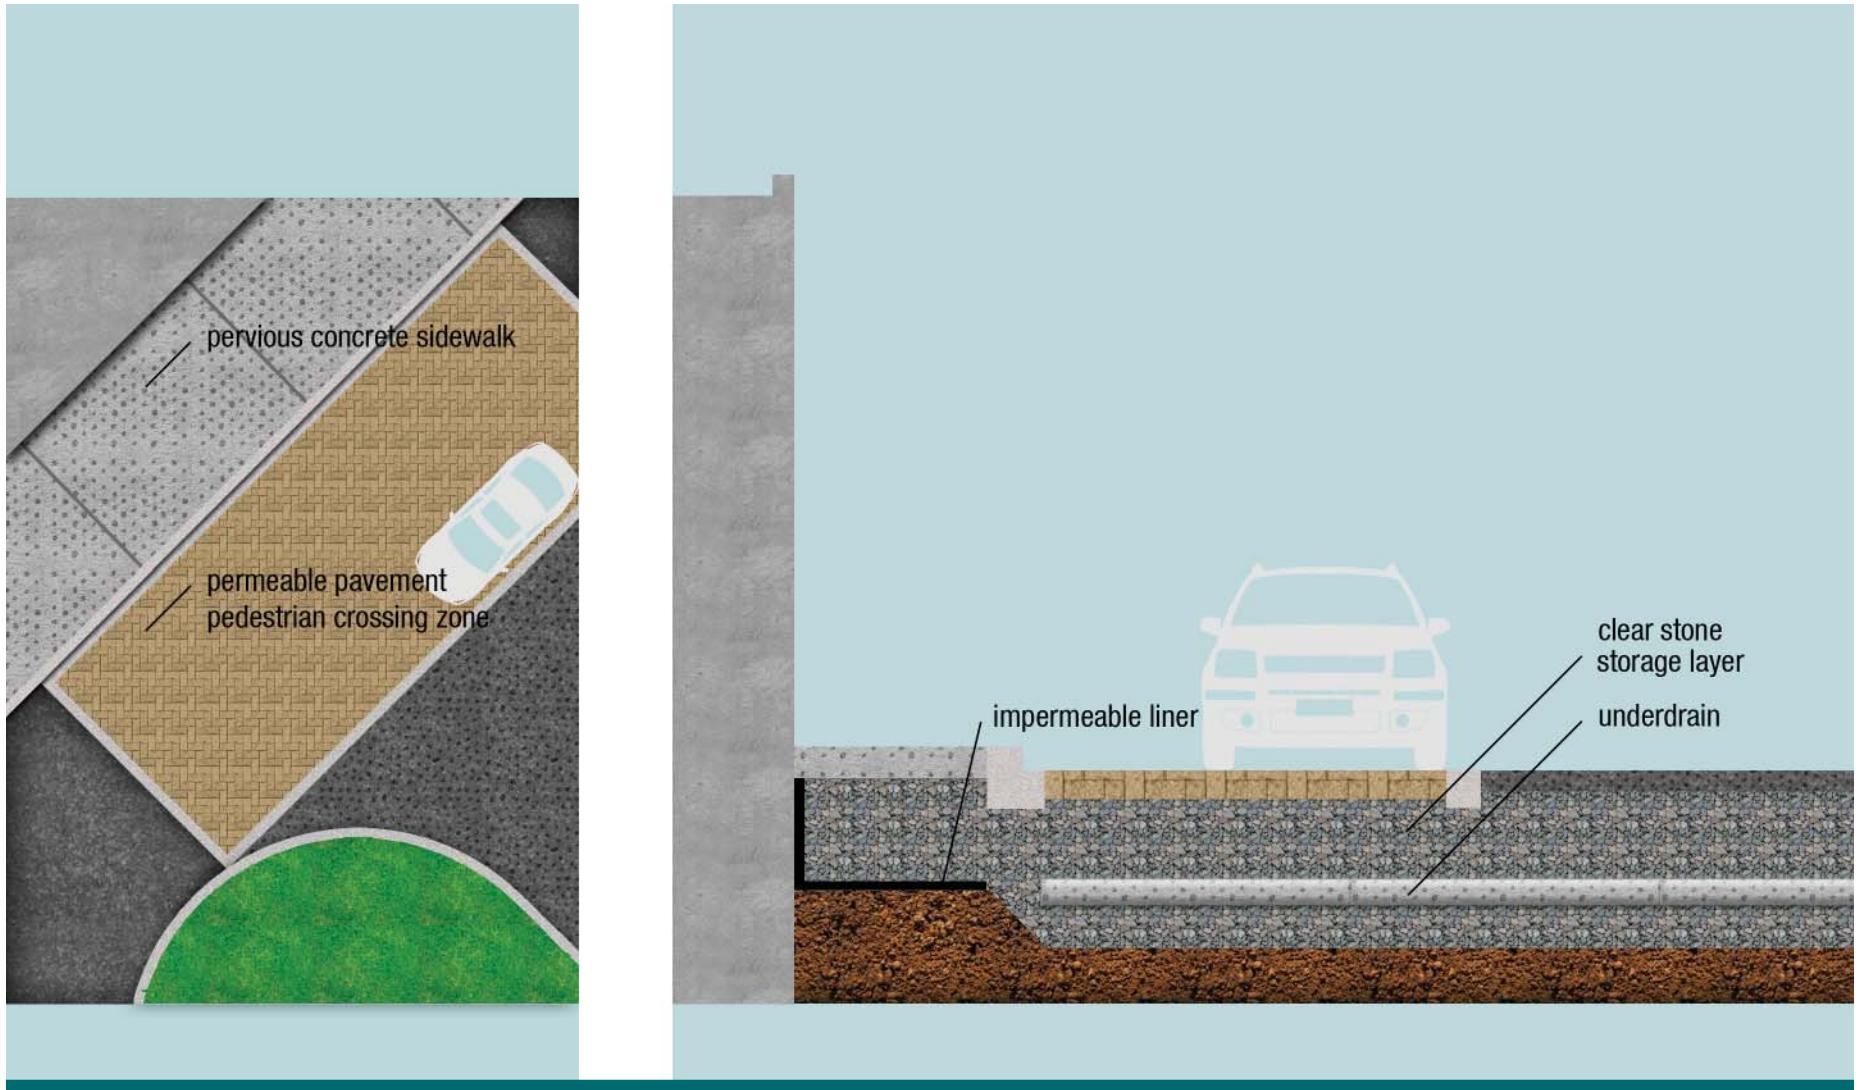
Aerial view [left] and cross-section [right] of permeable pavement options.
